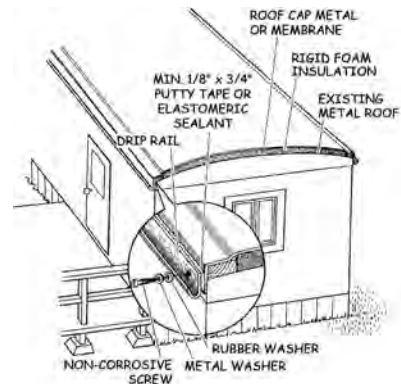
ROOF EDGE COMPONENT REASSEMBLY AND SEALING
